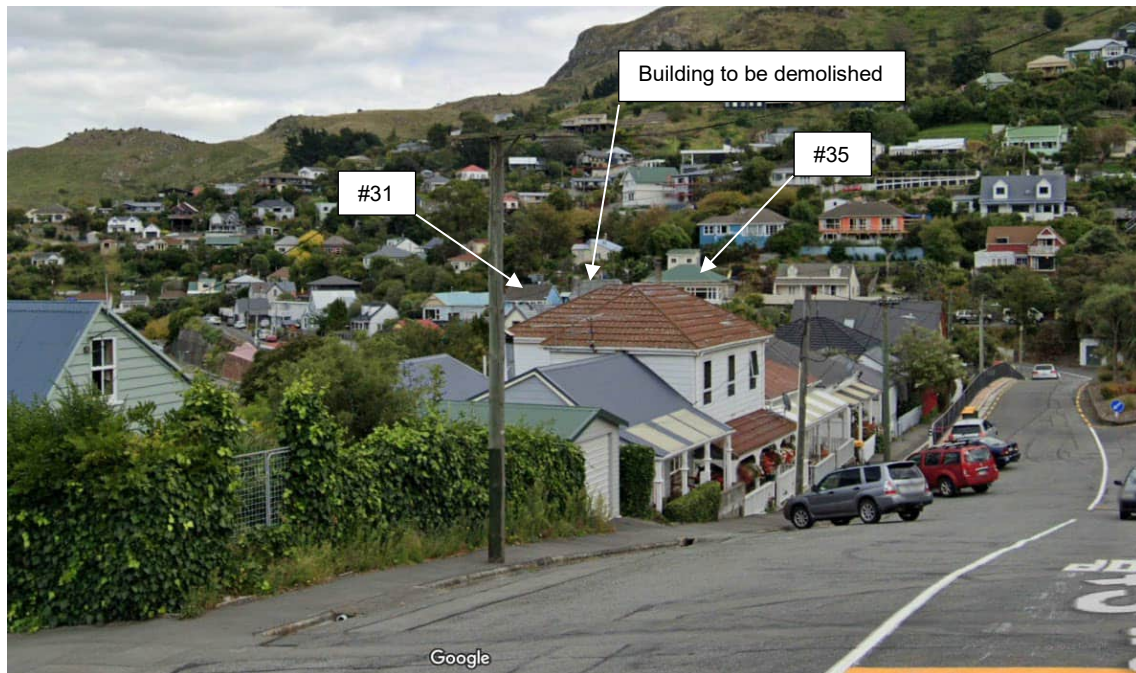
View towards the application site from intersection Exeter Street/Canterbury Street (Source: Google Streetview).
